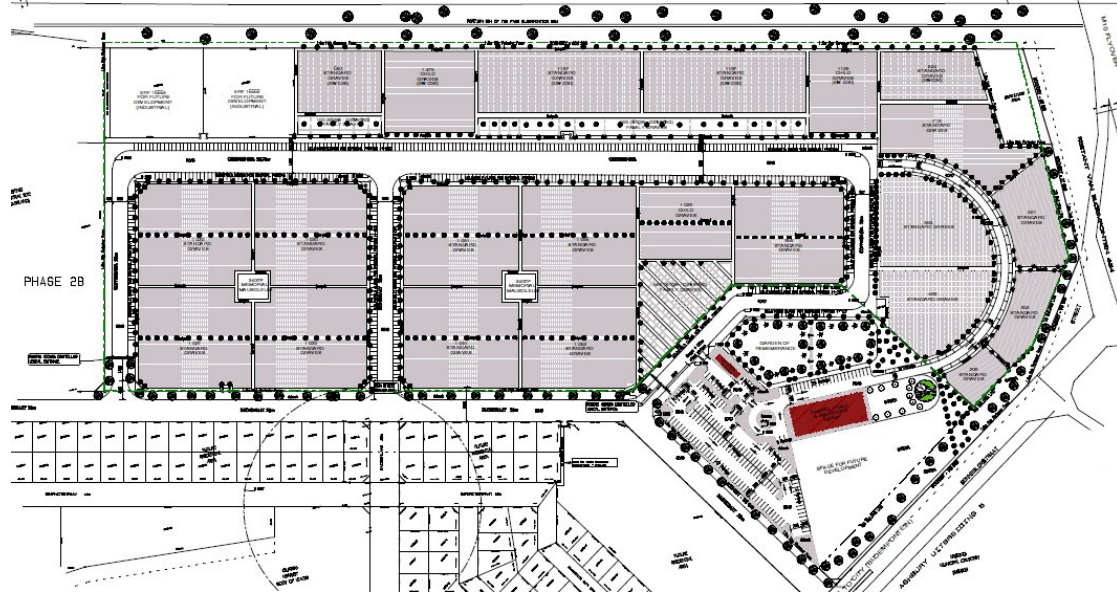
RE LAYOUT OF THE GENERAL PLAN TO ALLOW FOR THE PROPOSED CEMETERY.
